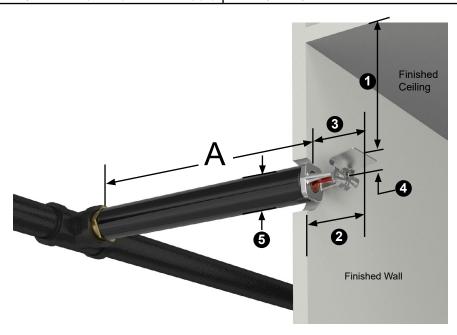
Plain Barrel Dry Horizontal Sidewall Sprinkler VK2753
